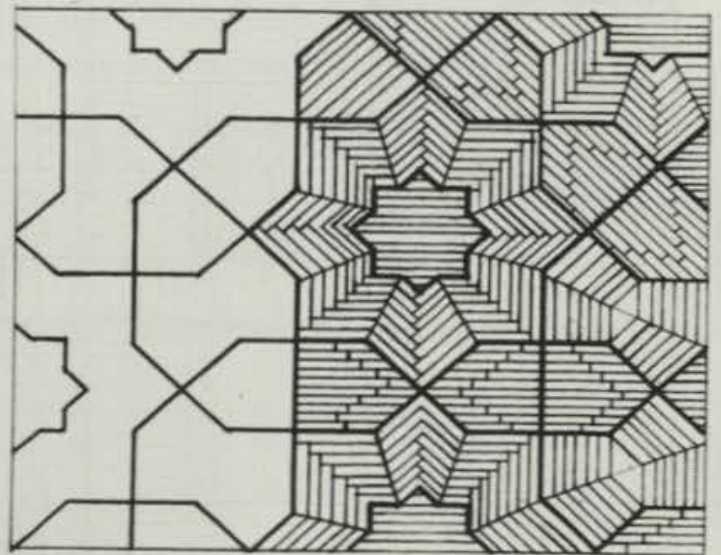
Wazir Khan Mosque, Lahore - cut and dressed flooring in geometrical pattern.
